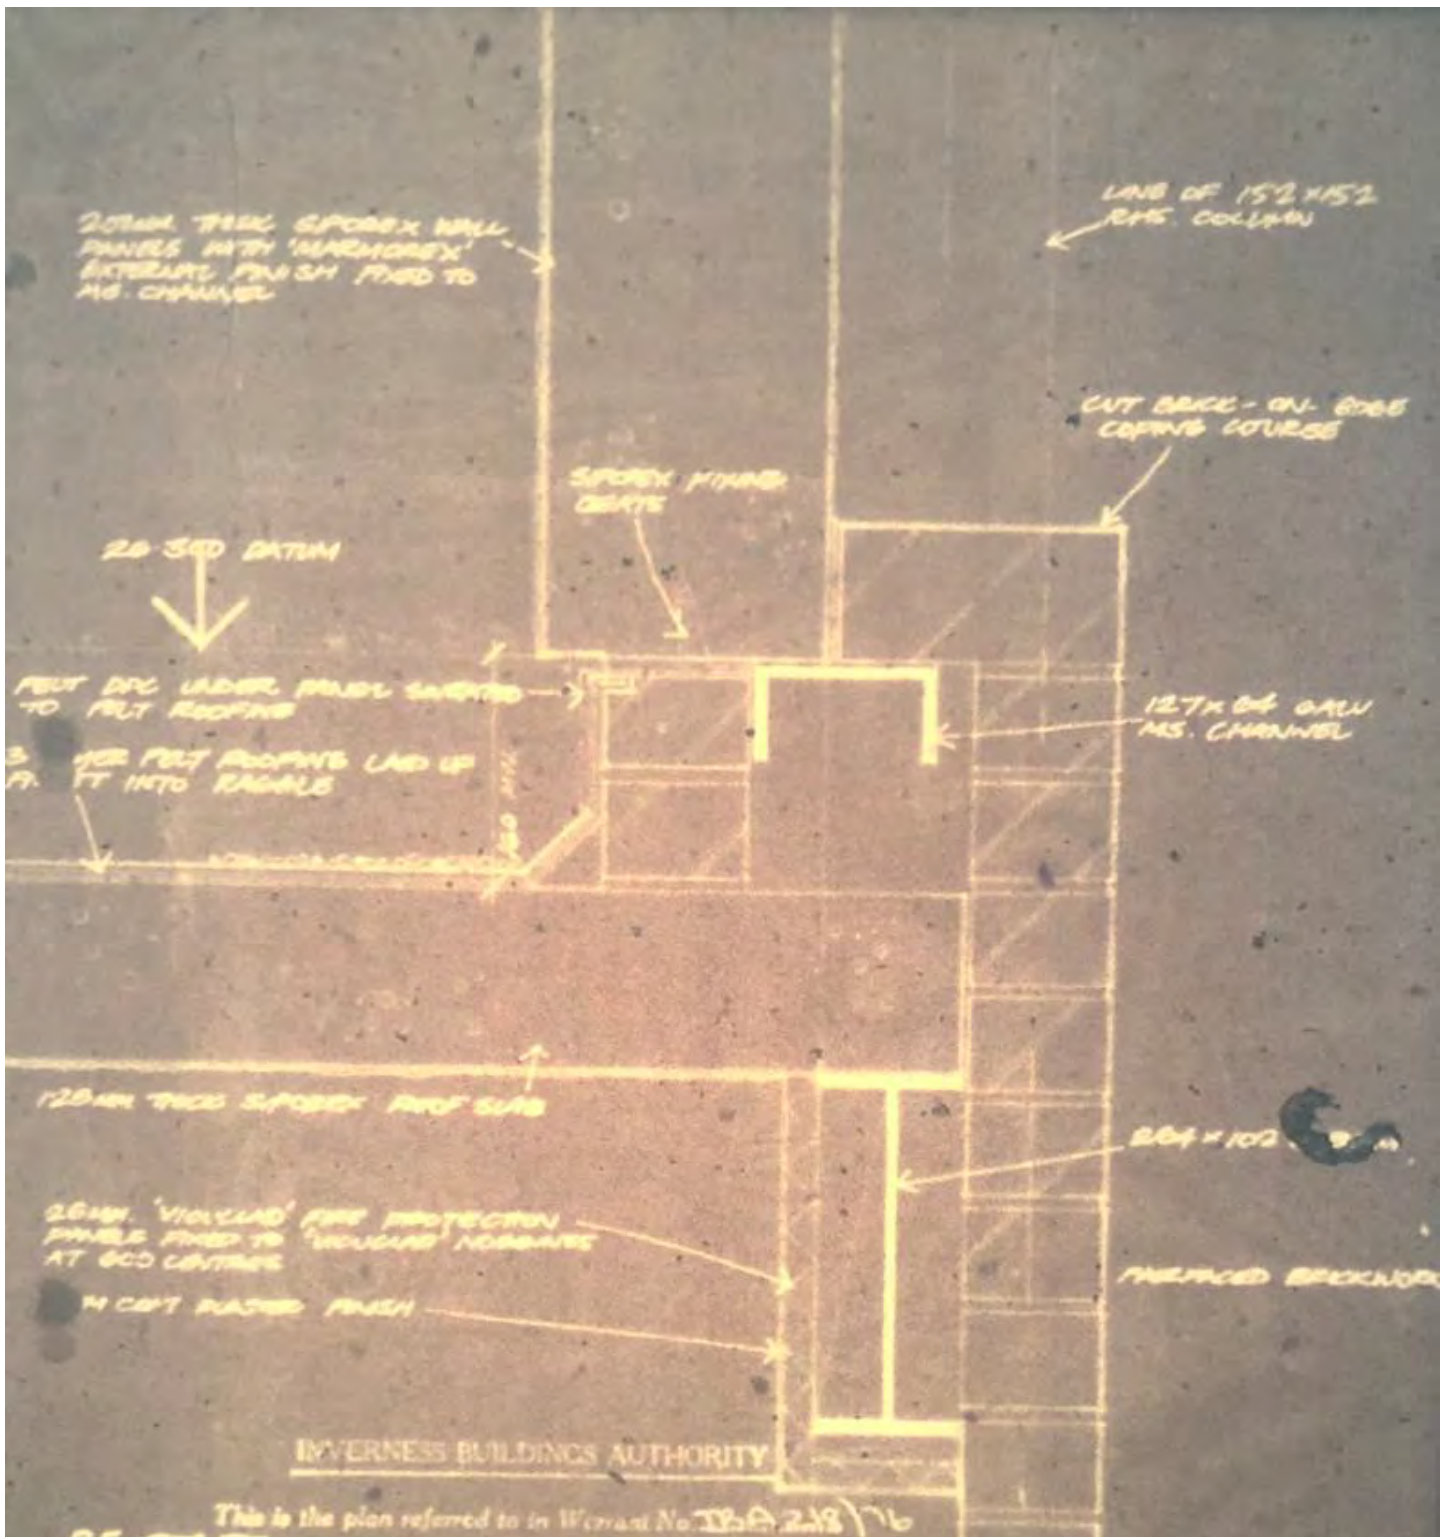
Indicating 152x152 RHS Column, 264x102UB & 127x64Channel
